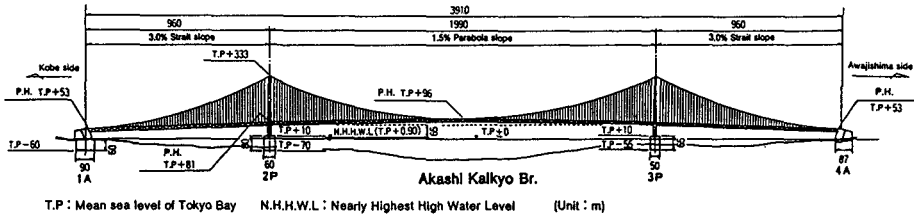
Side elevation of Akashi Kaikyo Bridge (Source: Honshu-Shikoku Bridge Authority).
